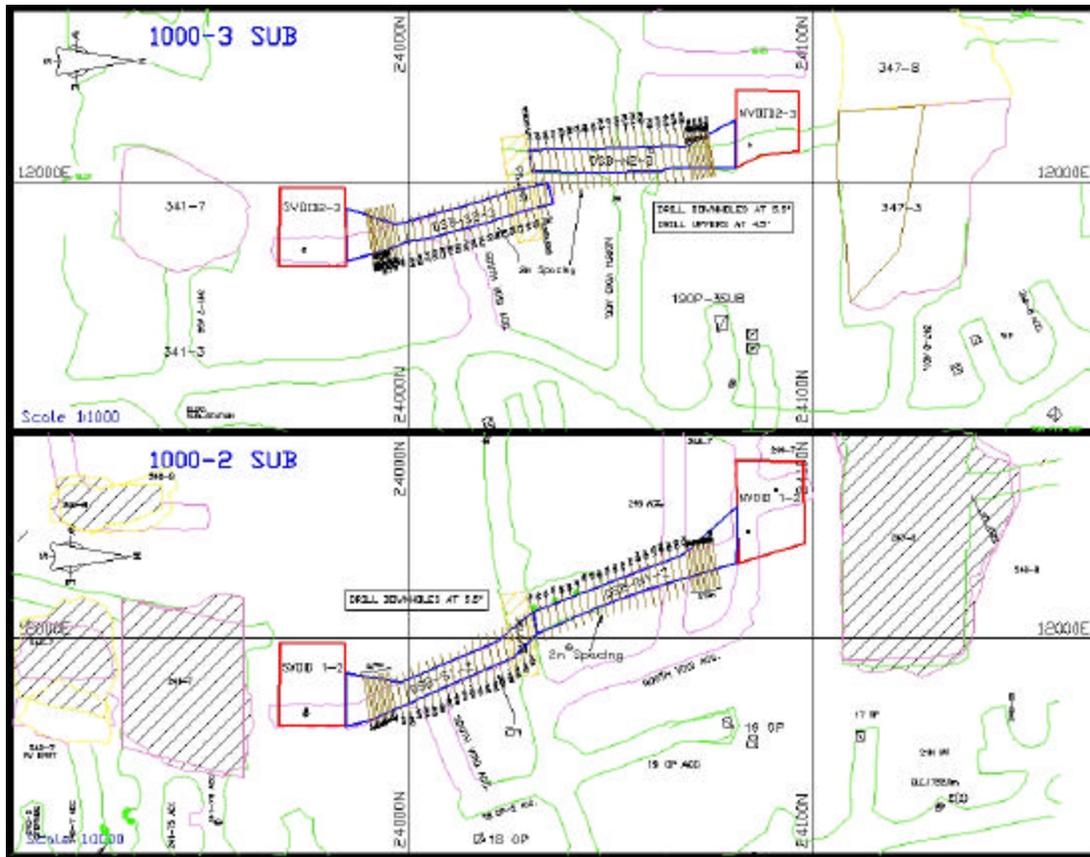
Plan view on 2-sub and 3-sub of 1000 m Level
